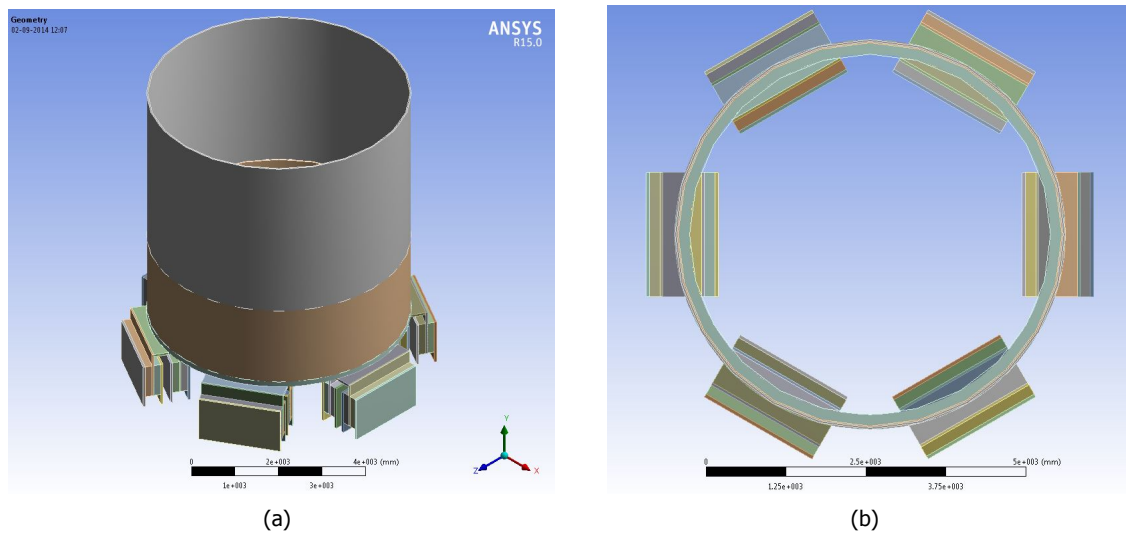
Overall arrangement (a) and top view detail for WTG positioning on the supporting plates (b)
